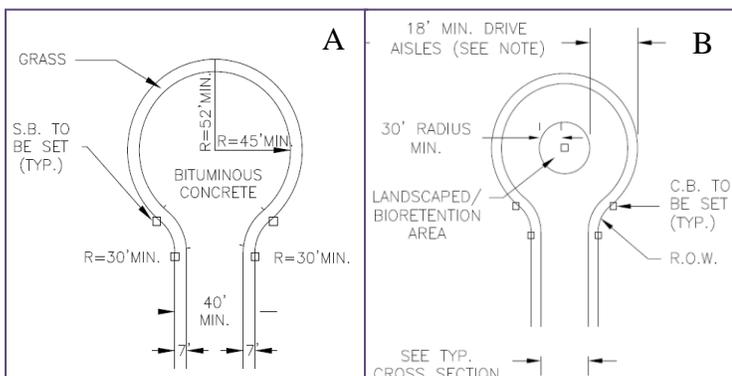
(A) Existing design details may require updating (B) to accompany revised street and parking requirements, such as in this revised cul-de-sac detail for Attleboro, MA that incorporates a reduced paved radius and a central bioretention/landscaped island.
